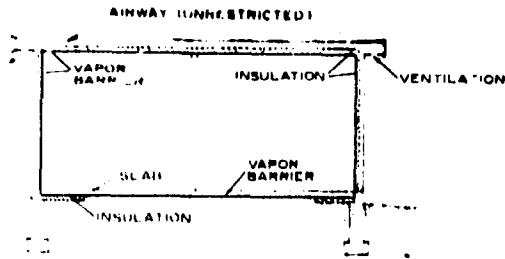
Location of vapor barriers and insulation in concrete slab and flat-deck roof. M 139 236
